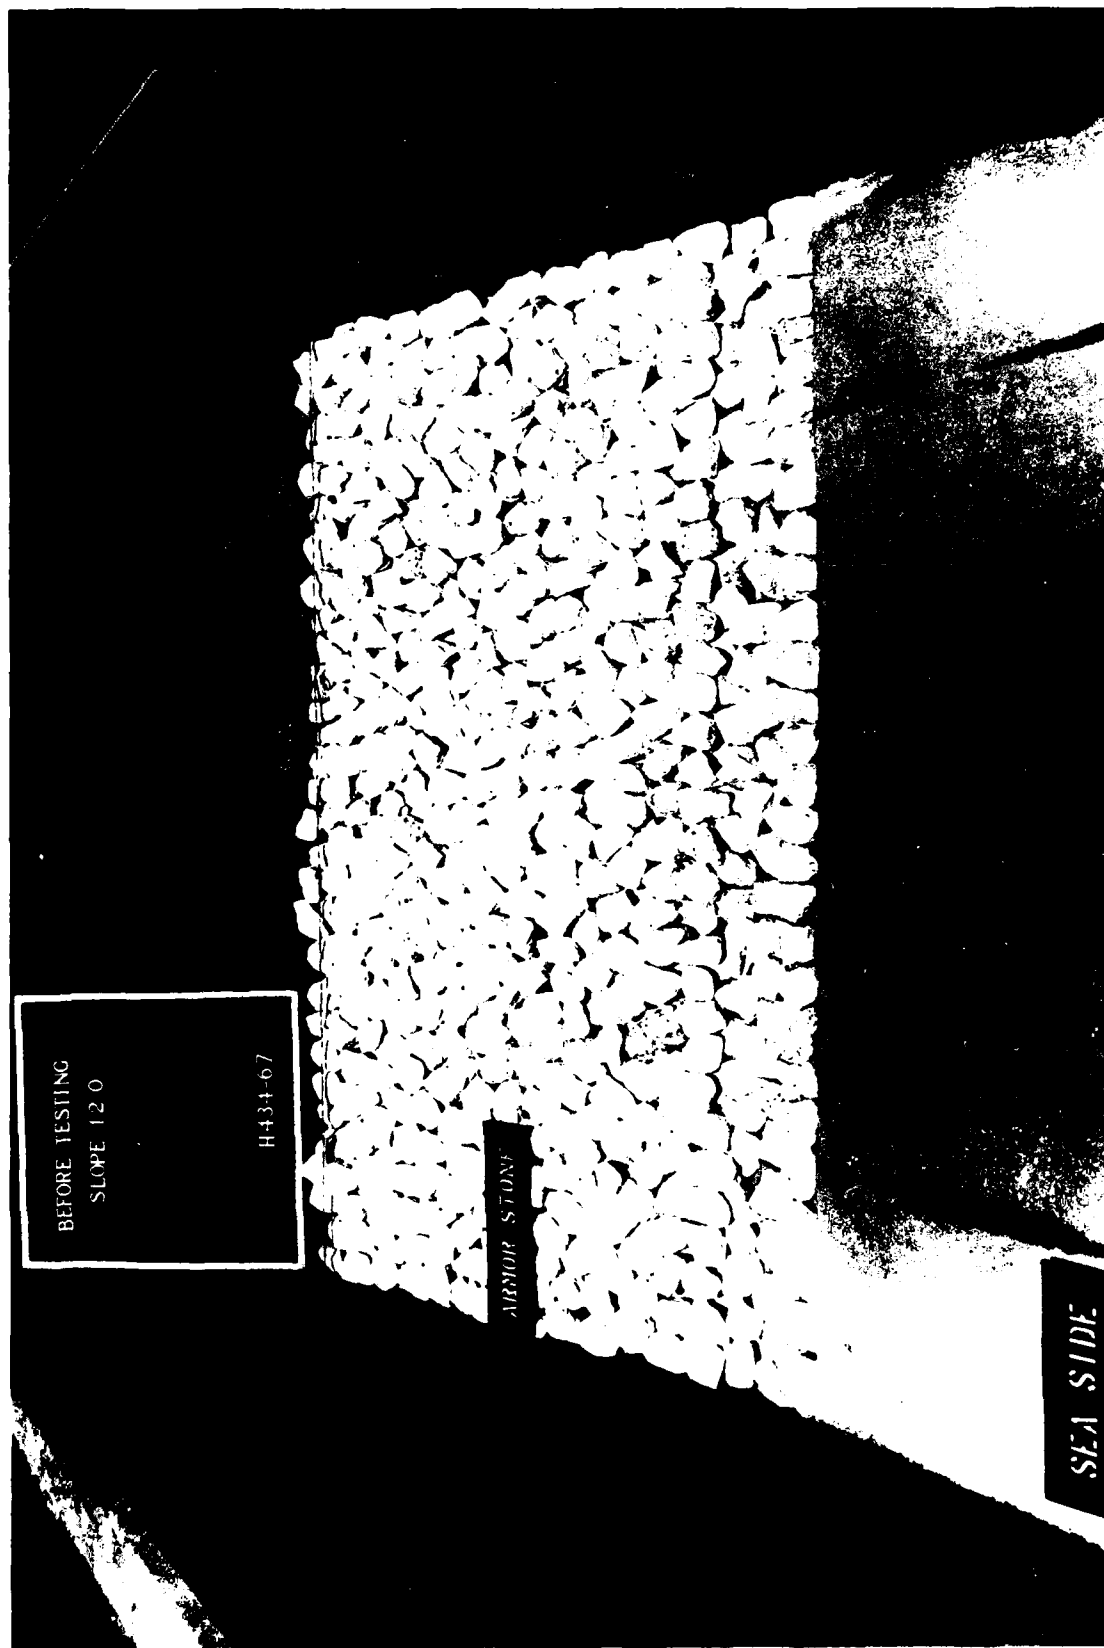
Sea-side view of a typical stone section before wave attack at a LV-on-2H sea-side structure slope;  $W_a = 0.38$  lb
